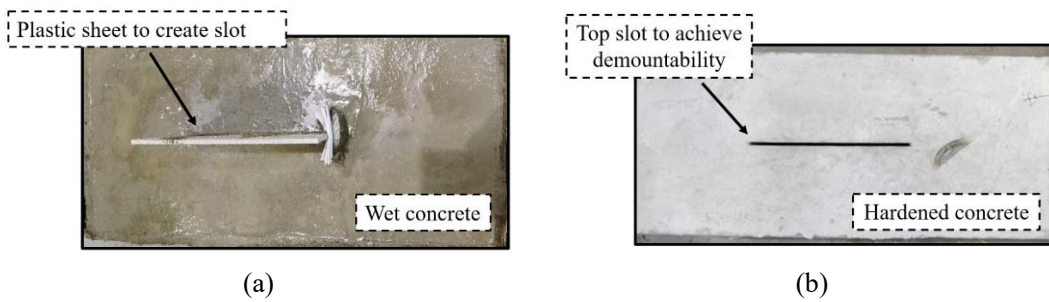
concrete specimen preparation (a) wet concrete with plastic sheet, (b) hardened concrete with top slot.
